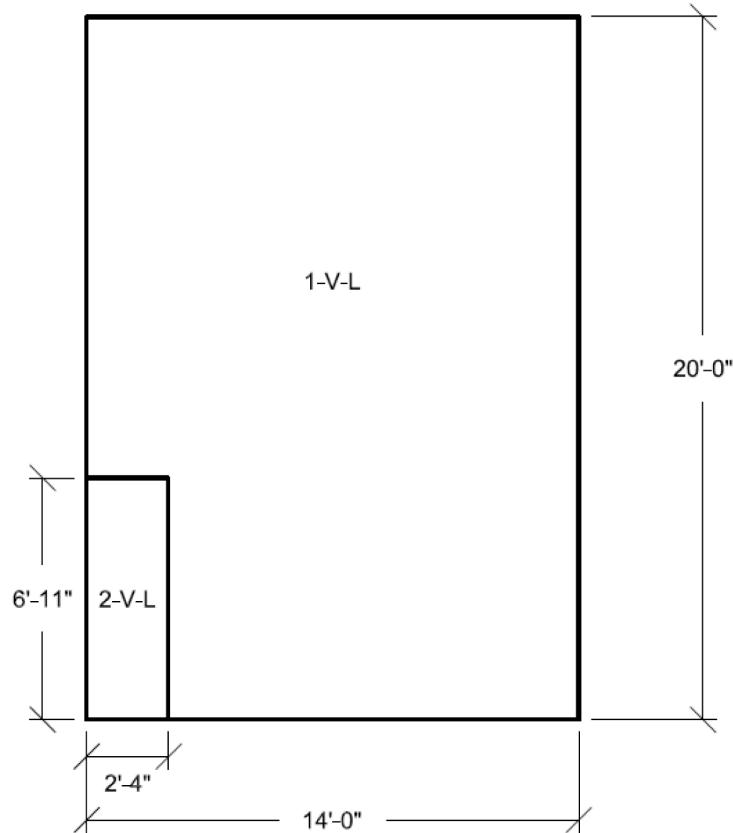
H.6-174 DGFSOV Wall 9 Looking From Outside Vertical Reinforcement Zones Near Side Face
